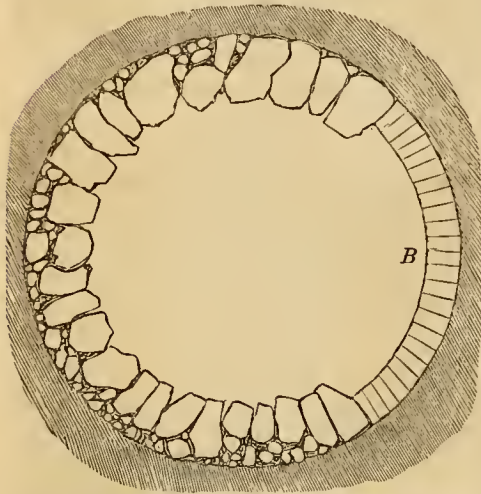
STONE AND BRICK WALLS TO WELLS.
